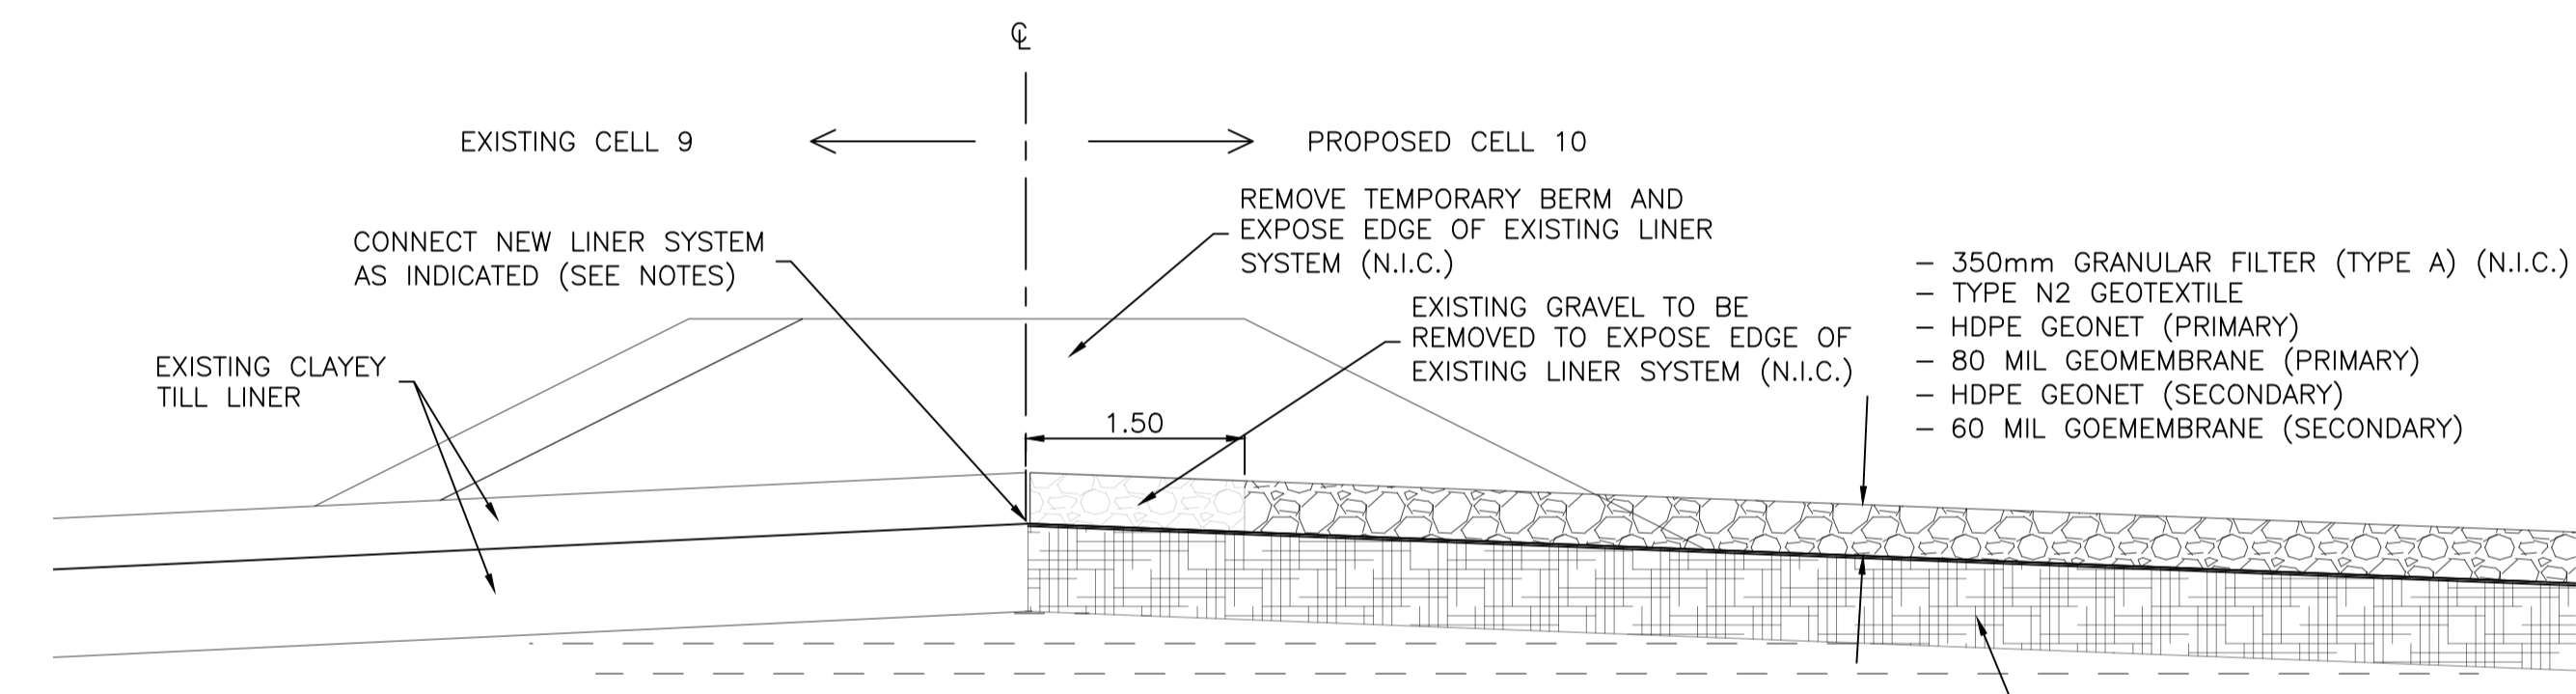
C2. Numero du Plan: 597-18-3-C2. Rev. 0
